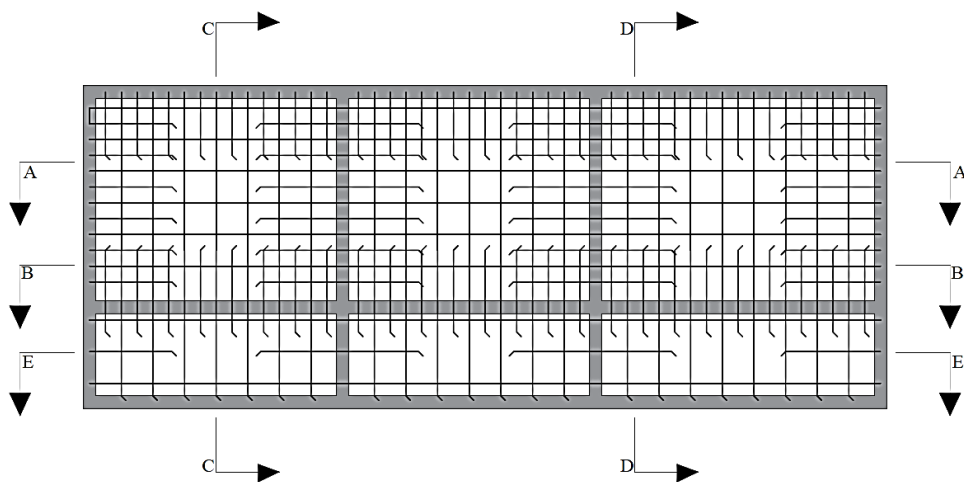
Plan view showing the distribution of longitudinal bars at the top layer of slab
